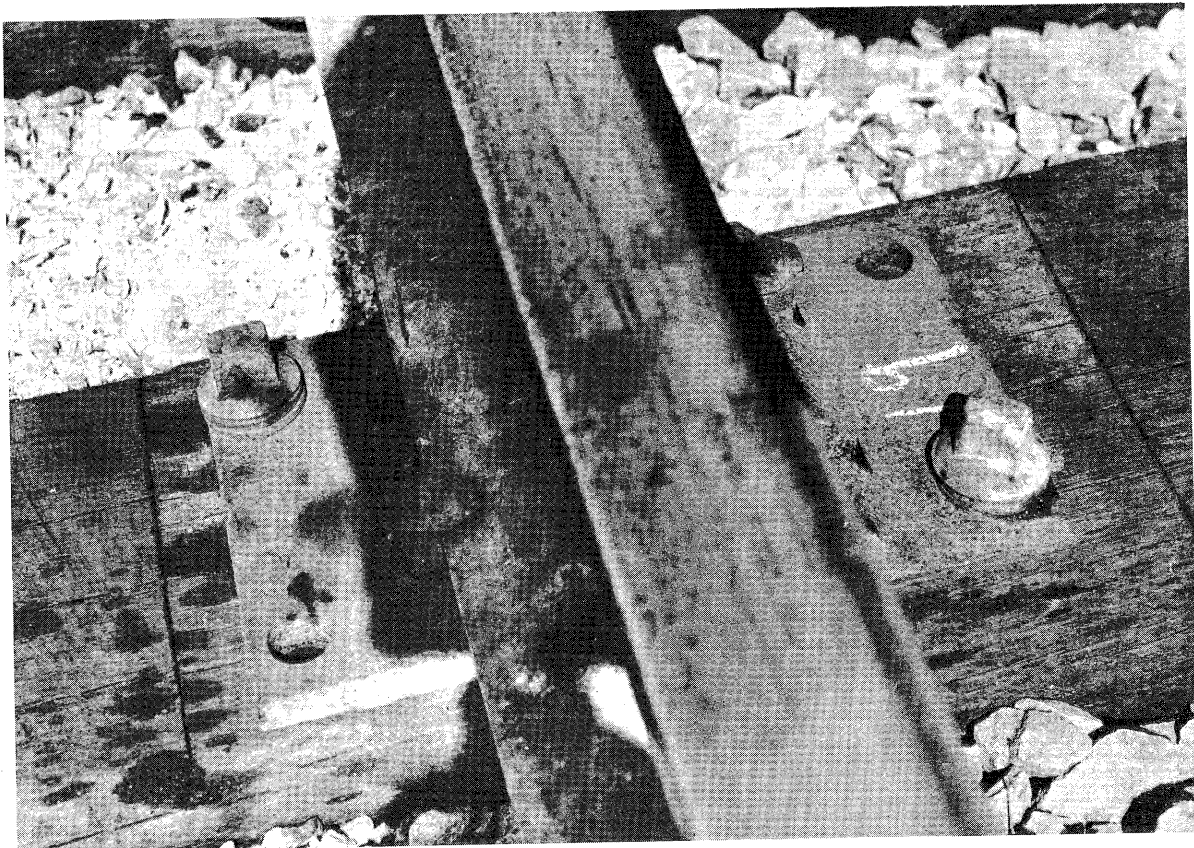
Section 19, Erie Single Shoulder, Diamond Bottom Tie Plate with 2 - 15/16 in x 6 1/2 in Screw Spikes and Double Coil Spring Washers.
